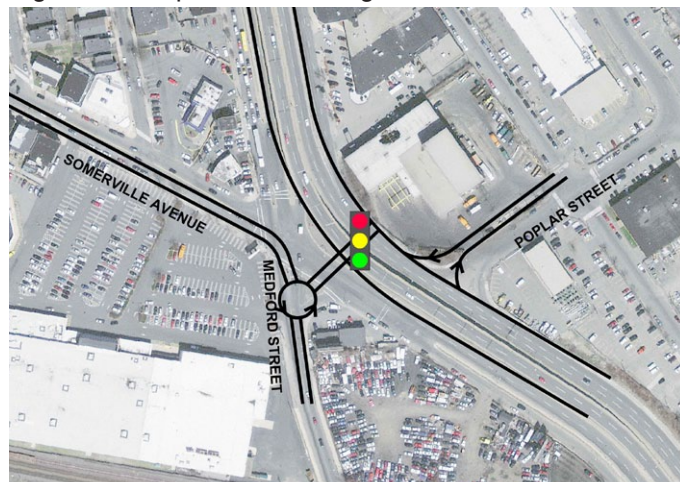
Somerville Avenue 3-Leg Roundabout
